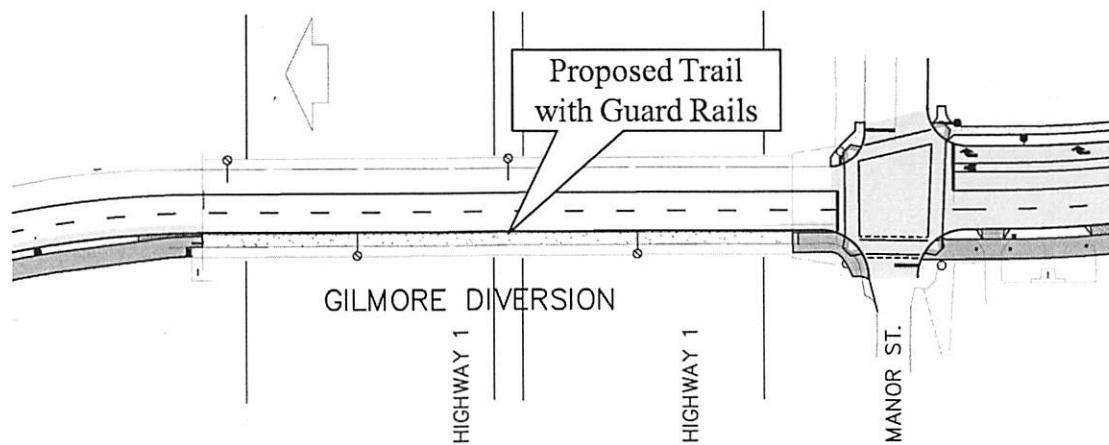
Proposed Urban Trail alignment on the Gilmore Overpass and North Abutment.
